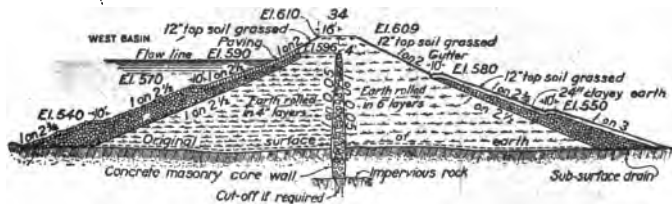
Cross-Section of South Wing, Olive Bridge Dam.
